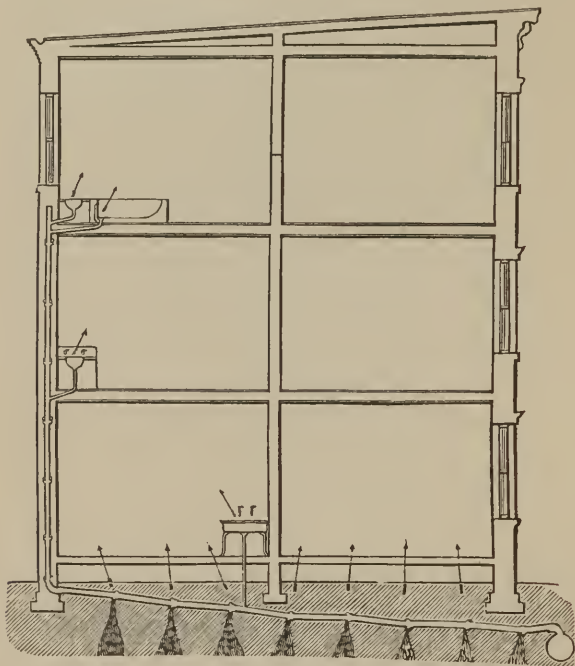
Condition of one of a row of houses in the southeast part of Washington, showing no trap to any fixture in the house, and the underground drainage defective. ("Sanitary Engineer.")
